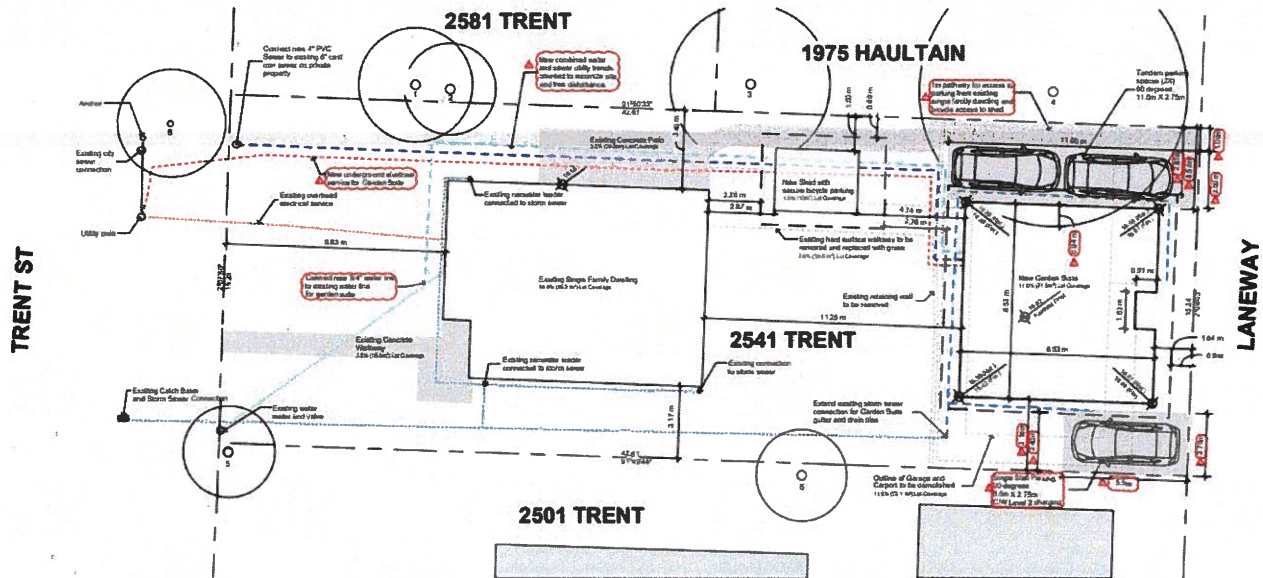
Site Plan (from plans by House Behind the Hedge Design Build)
